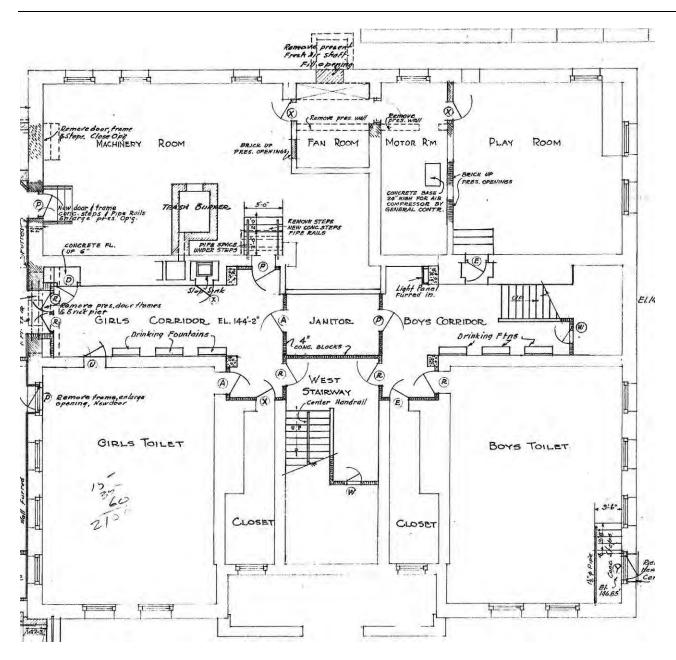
Switzer (South) School c. 1899 first floor plan Charles A. Smith, architect
